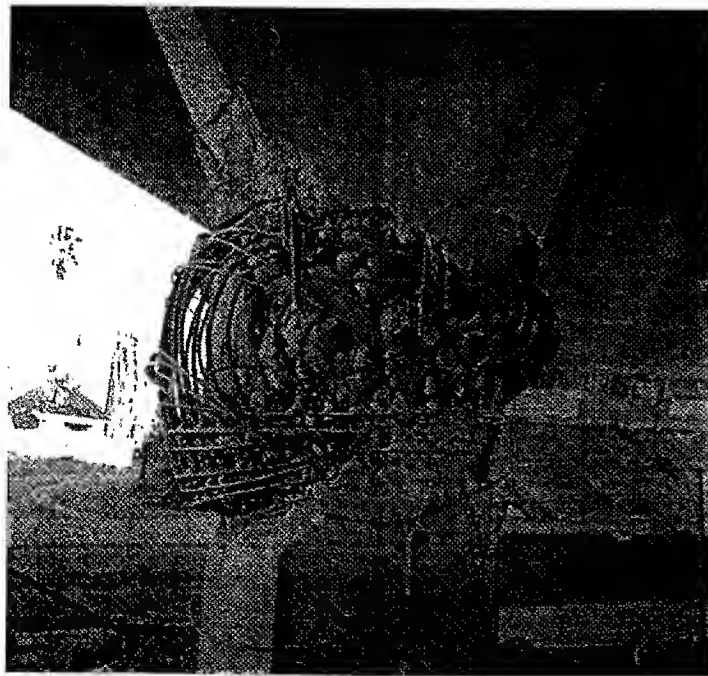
Bridge column failure due to lack of lateral reinforcement
